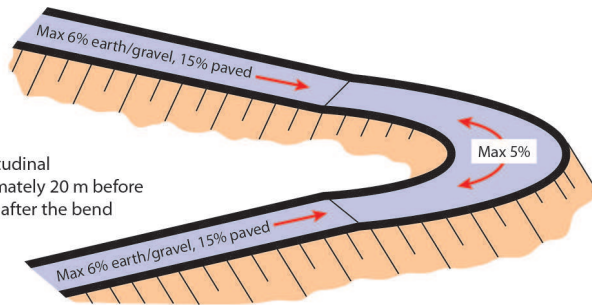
Recommendations for hairpin bends (image courtesy R. Petts).
